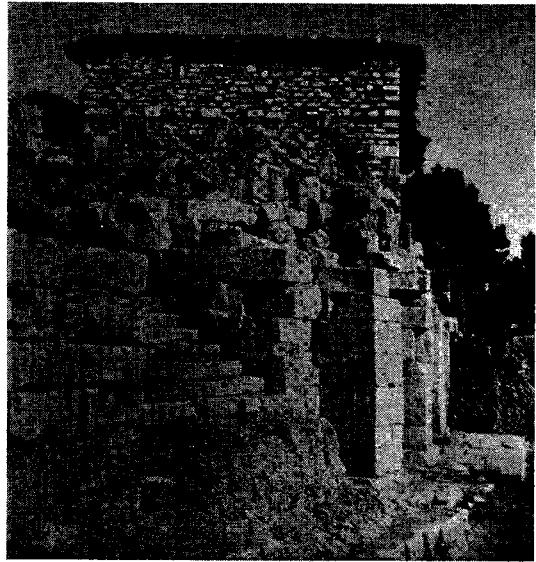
Butressed wall, vomitorium and "sidewalk".
